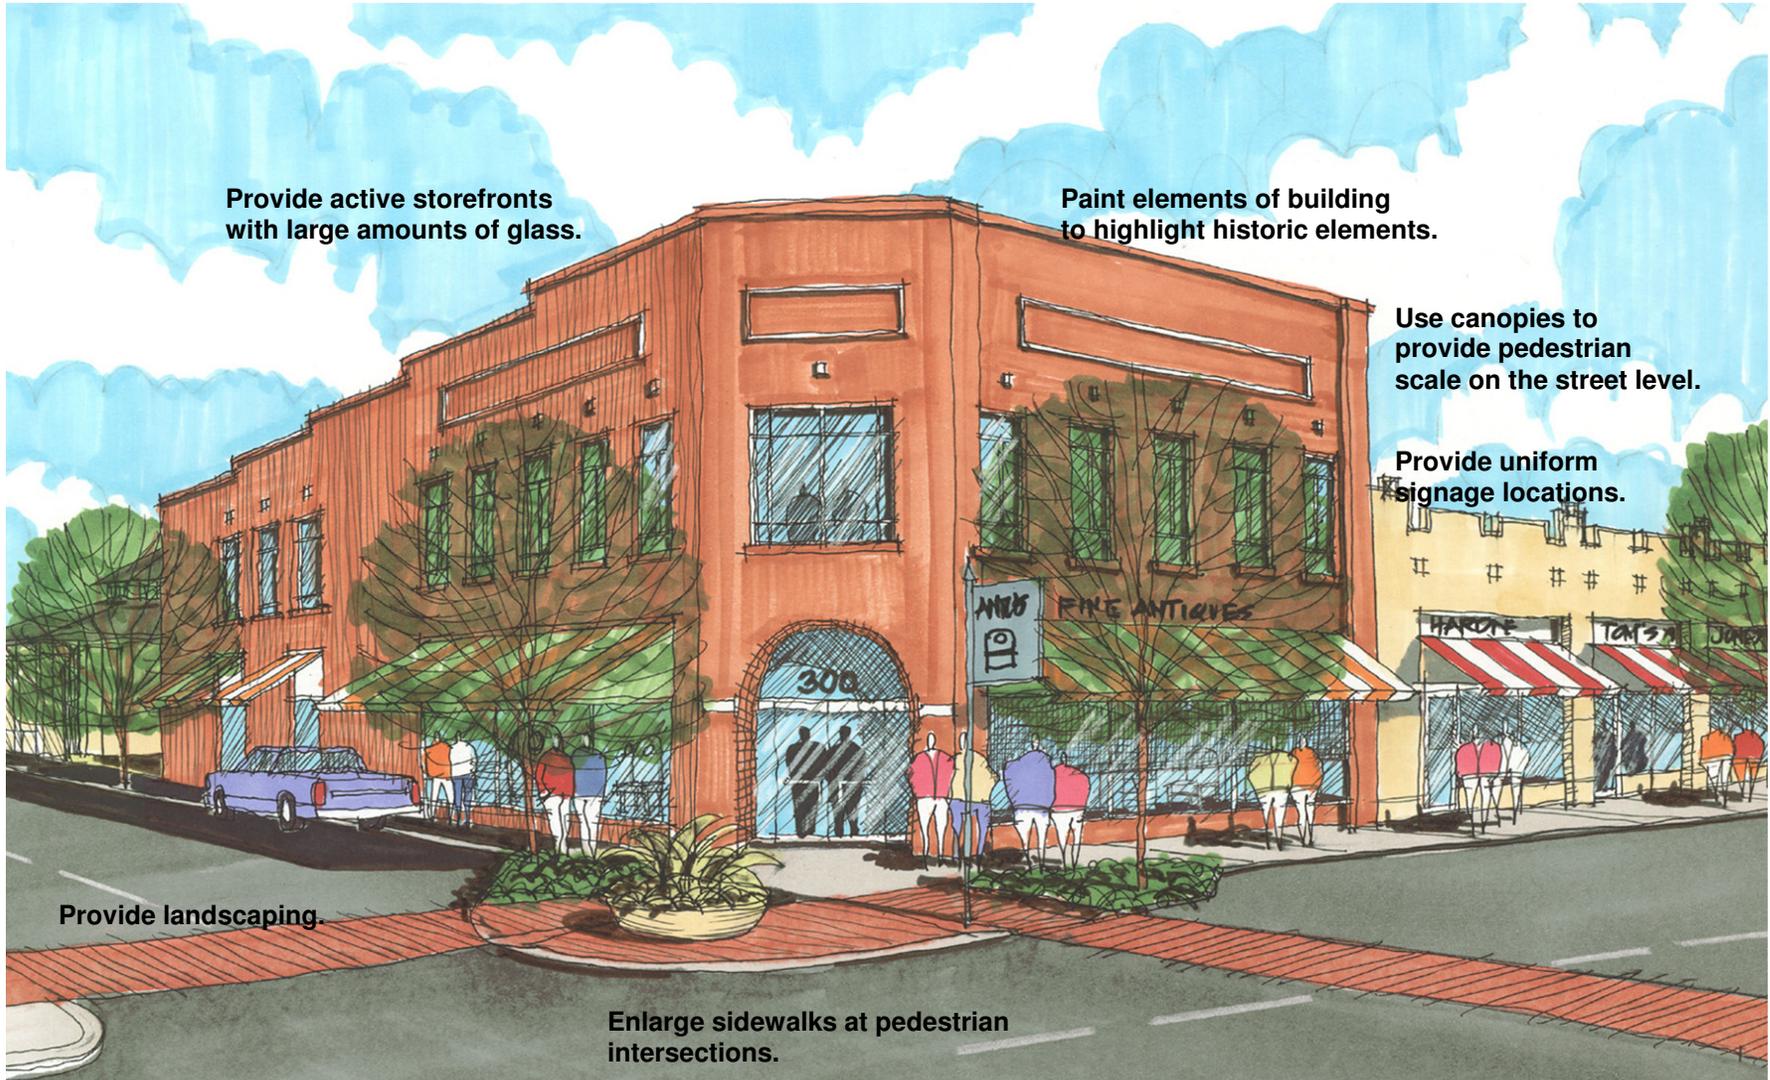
Existing Building Renovation – Dickinson Avenue
